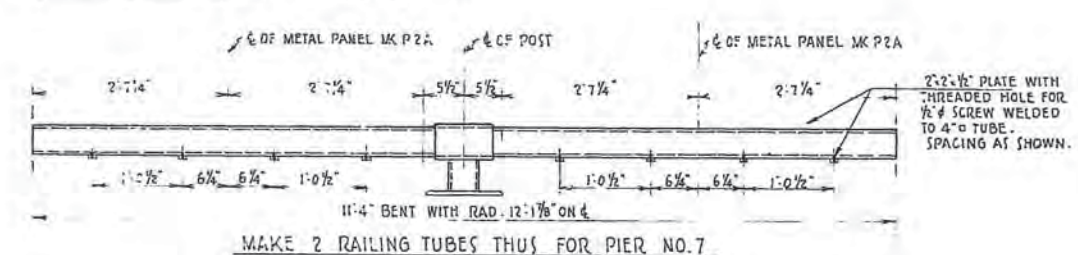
DETAIL OF RAILING TUBE FOR PANELS P2, P4 & P5
